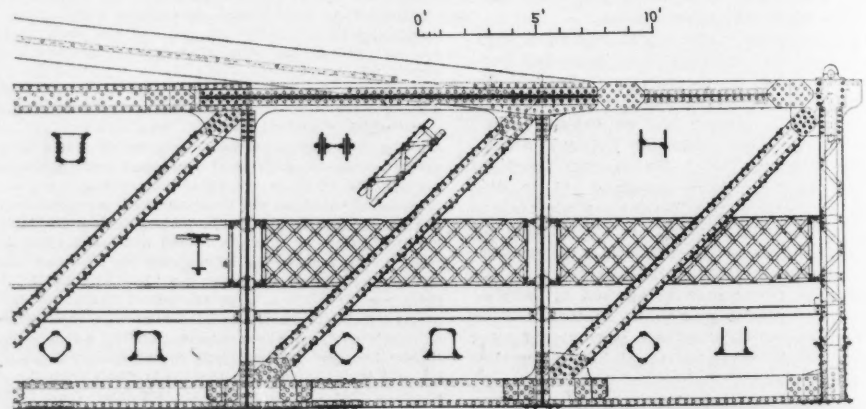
DETAIL AT END OF CANTILEVER ARM NEXT TO SUSPENDED SPAN, SHOWING "TOP CHORD" CONNECTION, THEISS RIVER BRIDGE.
